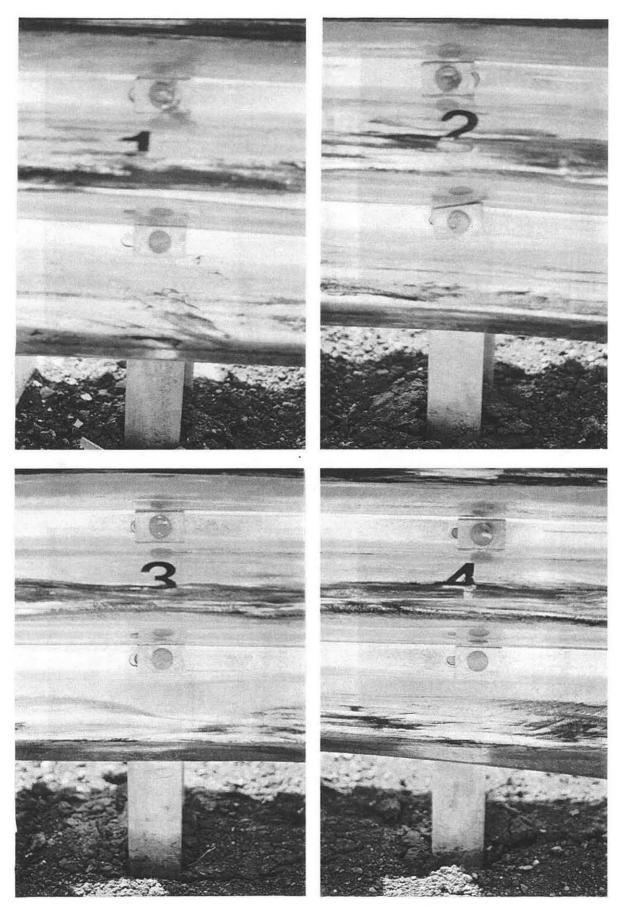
Thrie Beam Damage - Post Nos. 1 through 4, Test MTSS-1
